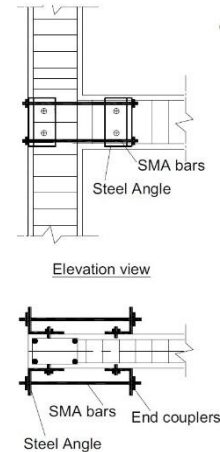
Concrete column-beam rehabilitation technique proposed by Elbahy et al. (2019)
